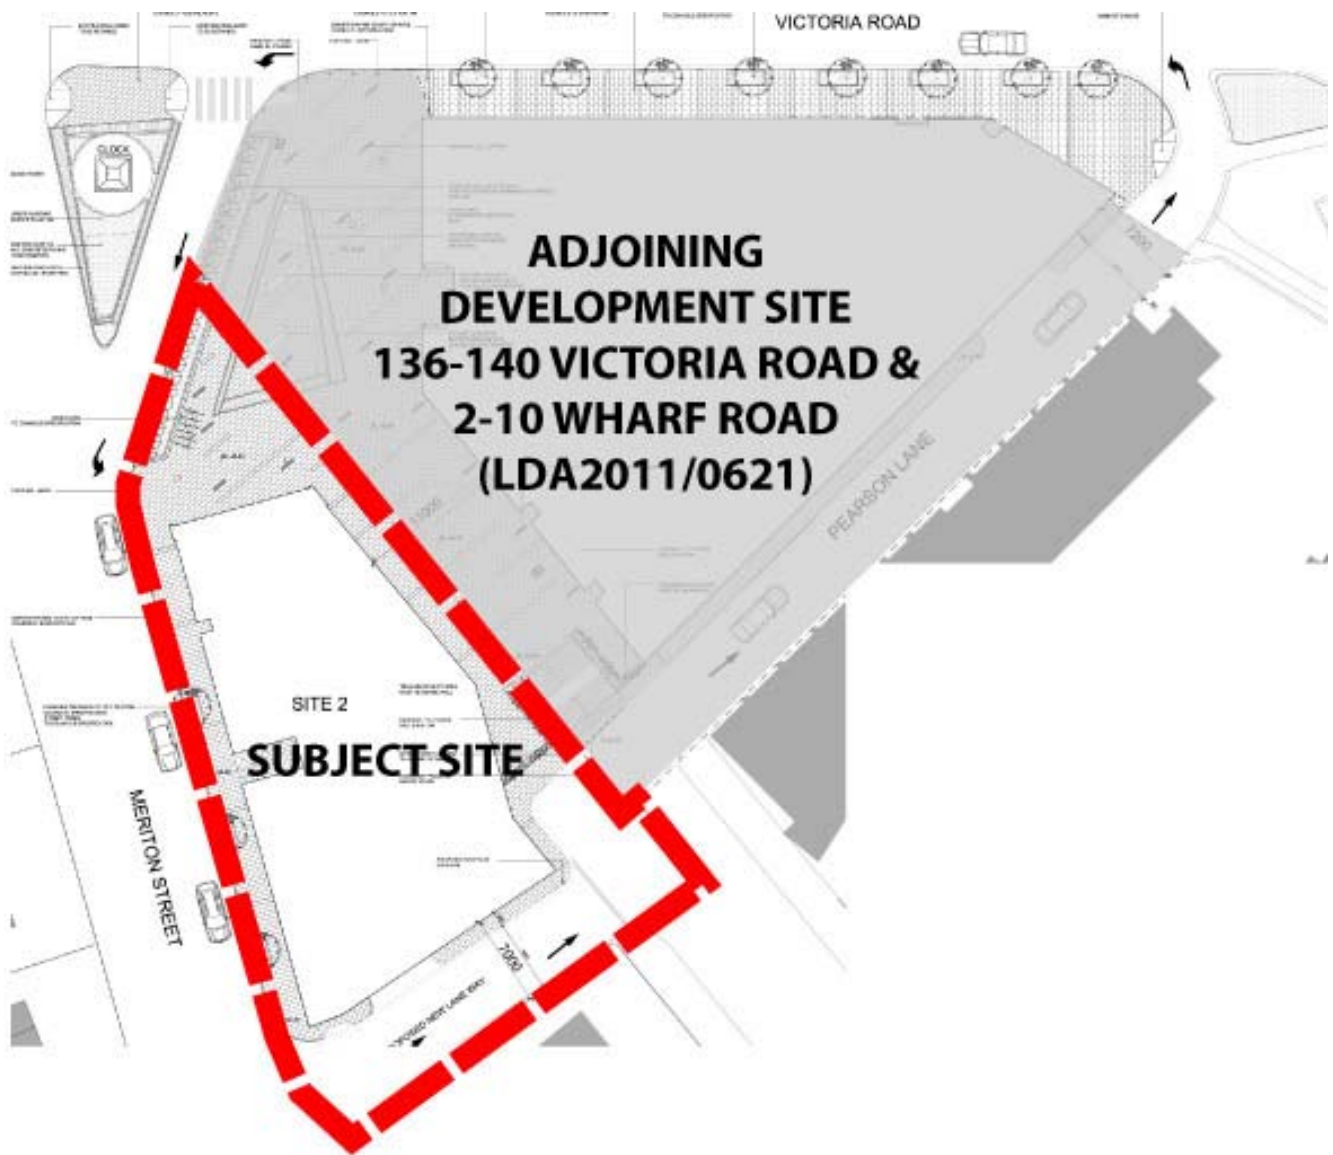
Subject site and adjoining development site at 136-140 Victoria Road and 2-10 Wharf Road
